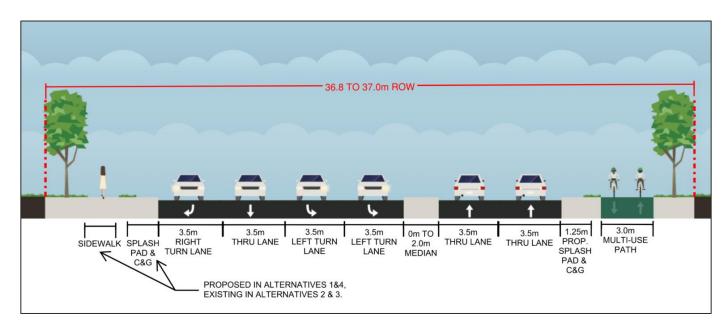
Typical Cross-Section for Bramalea Road, North of Derry Road (facing north)
